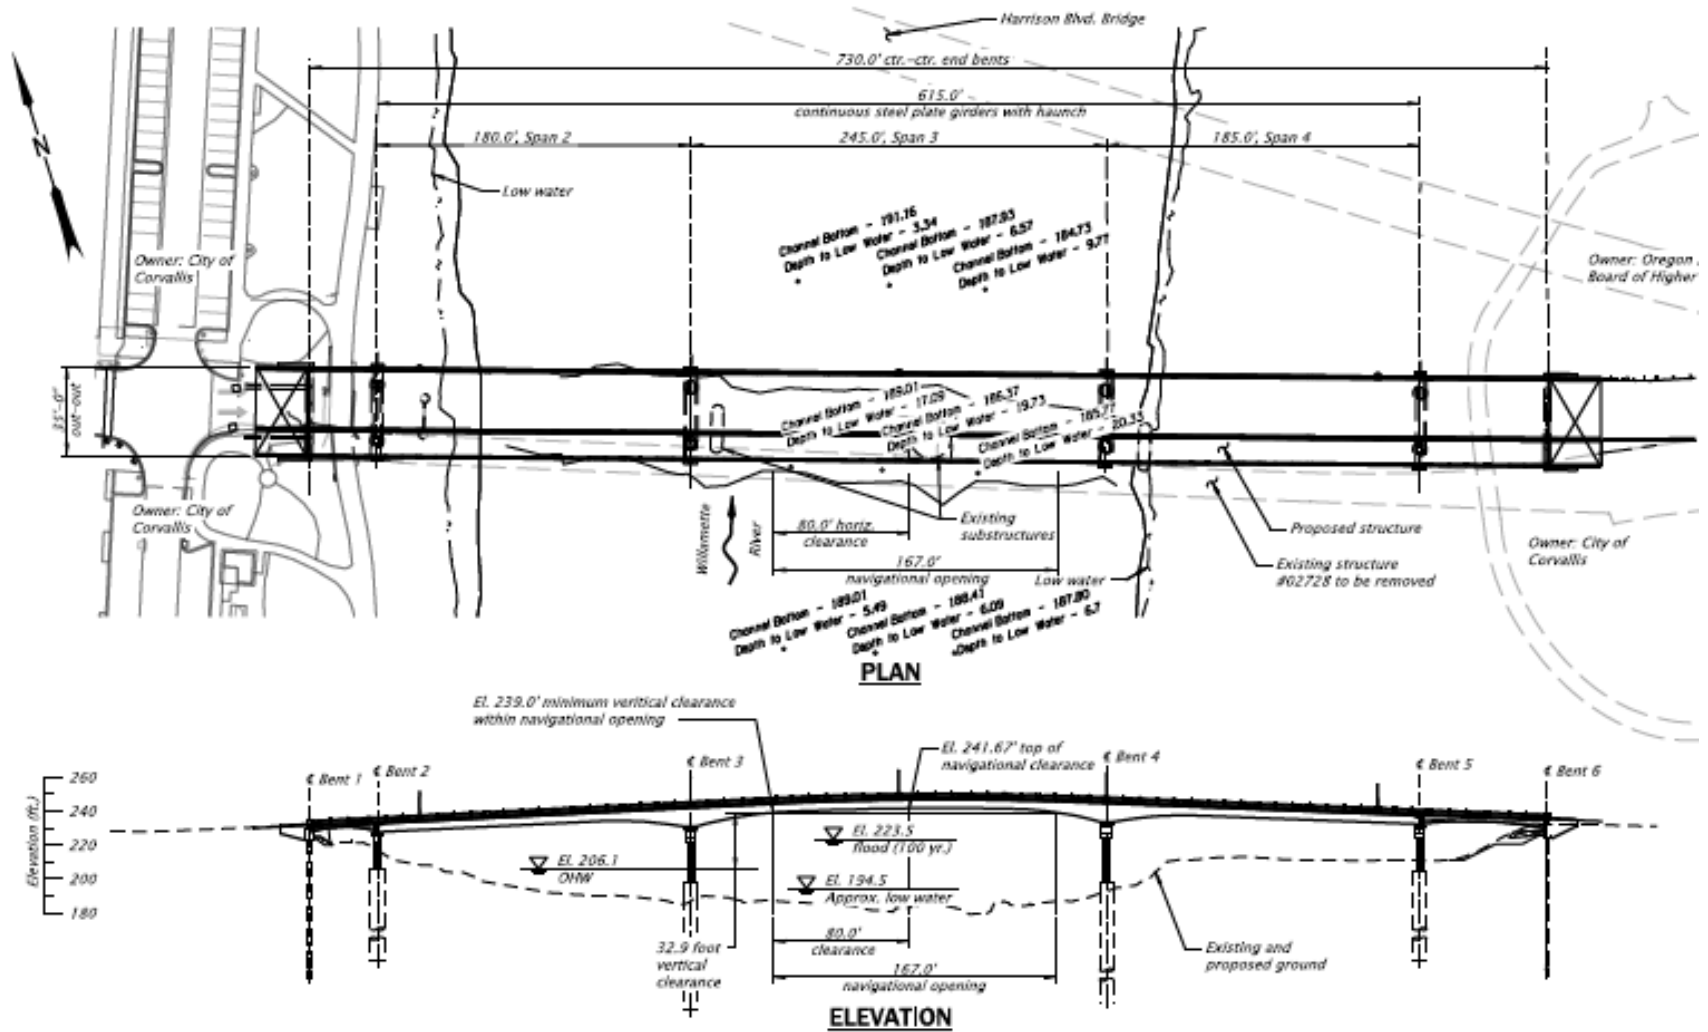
Plan and Elevation View for Proposed New Van Buren Bridge
